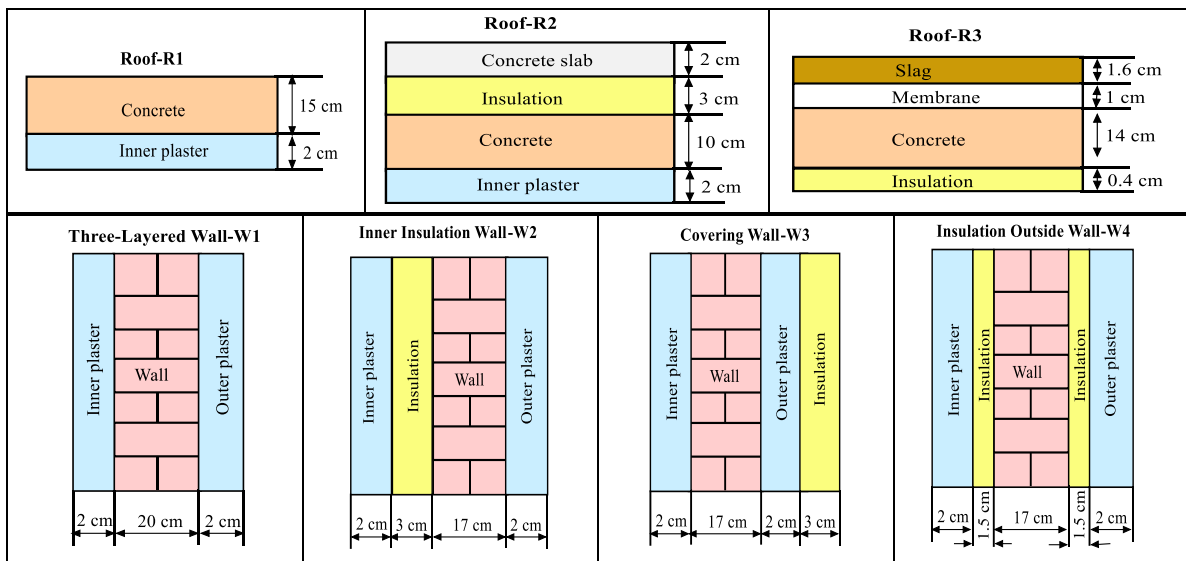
Schematic view of a multilayer wall or flat roof configurations used in this study.
